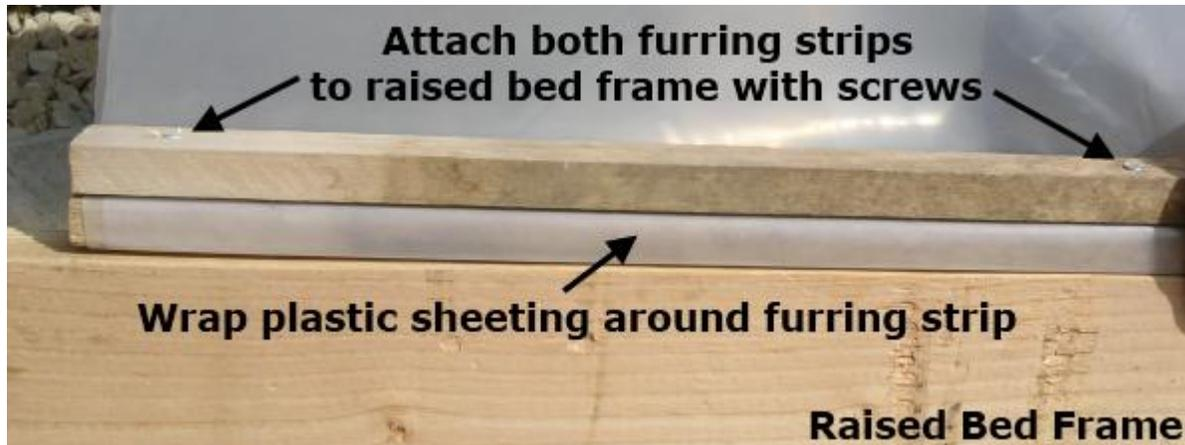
Plastic Sheeting attached to raised bed frame with single wood furring strip, screws and washers. Wrap the plastic several times around the furring strip and be careful not to cut the plastic. This method will still hold for the entire season even if the plastic is cut.
